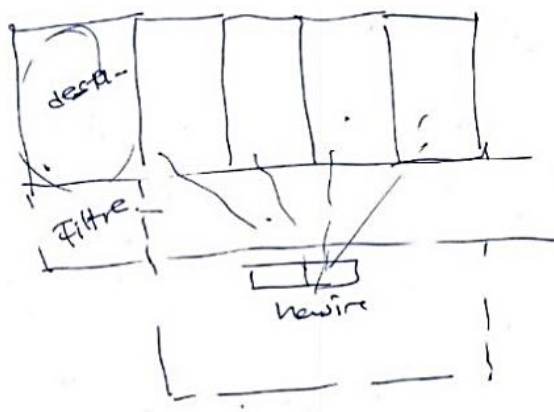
Floor plan of *ICU* (I.2, p.4)
